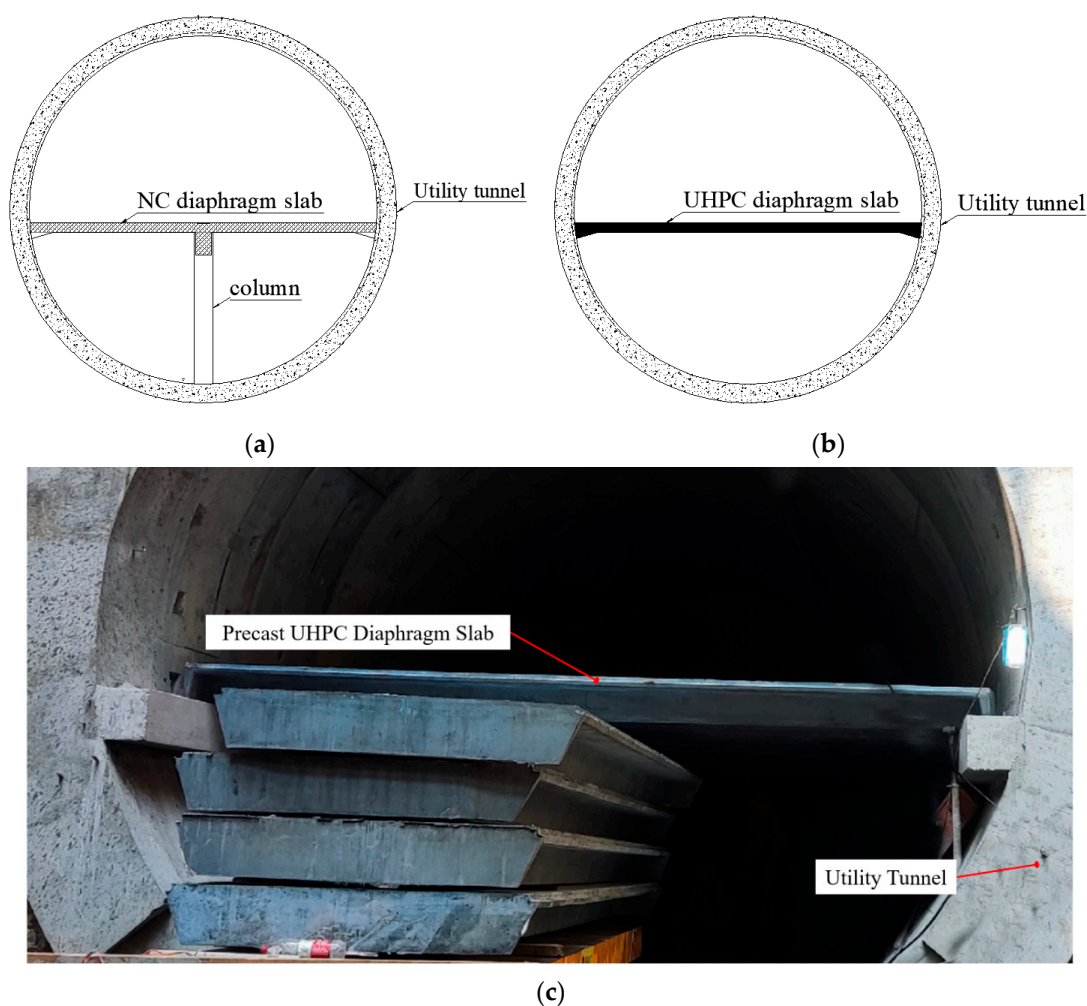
Schematic drawing of utility tunnels. (a) NC diaphragm slab, (b) ultra-high-performance concrete (UHPC) diaphragm slab, (c) Installation of precast UHPC diaphragm slab.
